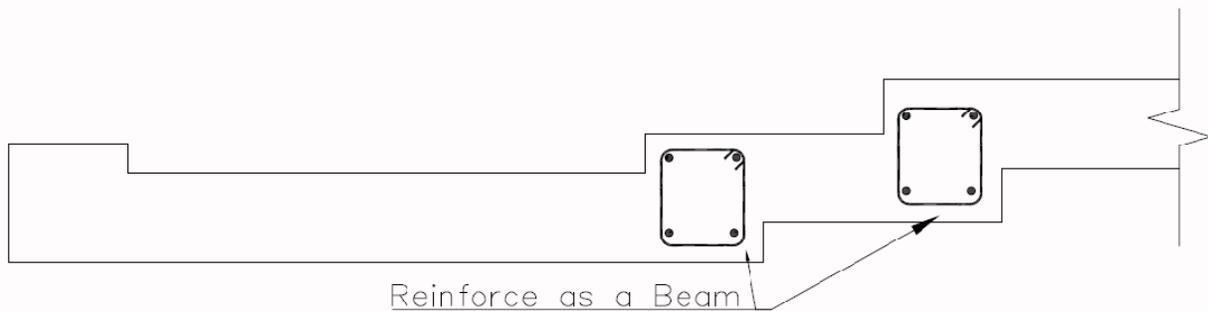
Alternative PT Balcony Cross Section to Accommodate Flooring
